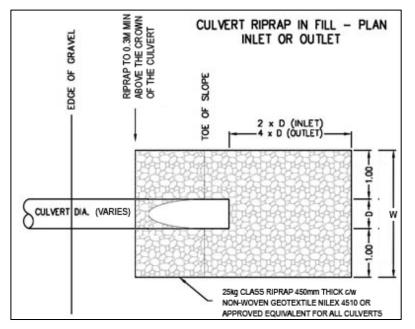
Inlet or Outlet Protection of Culvert – Plan View
